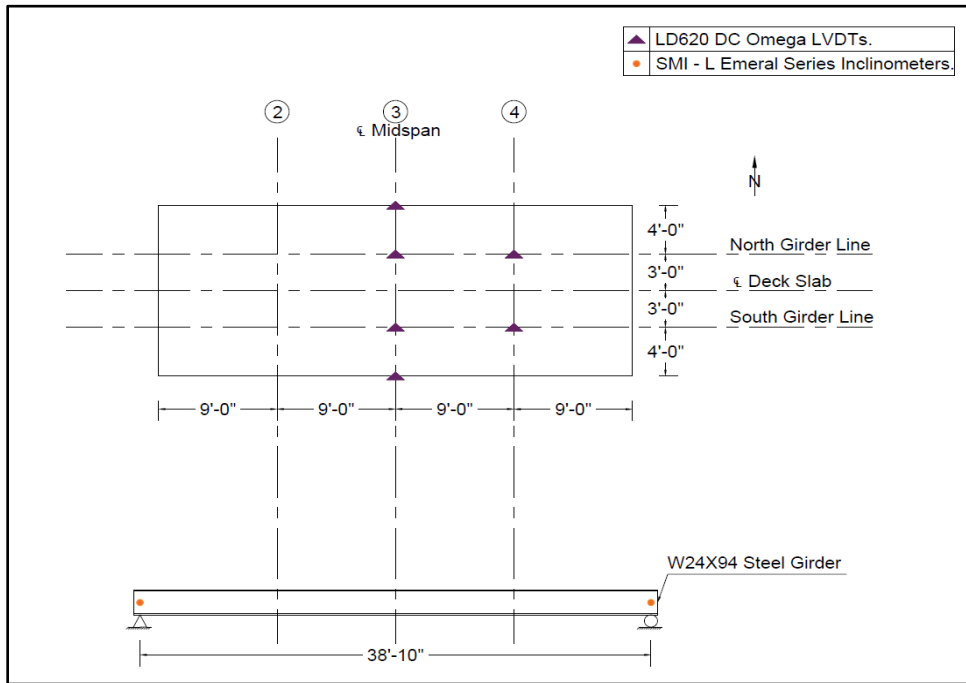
Layout of LVDTs and inclinometers on the prototype bridge
